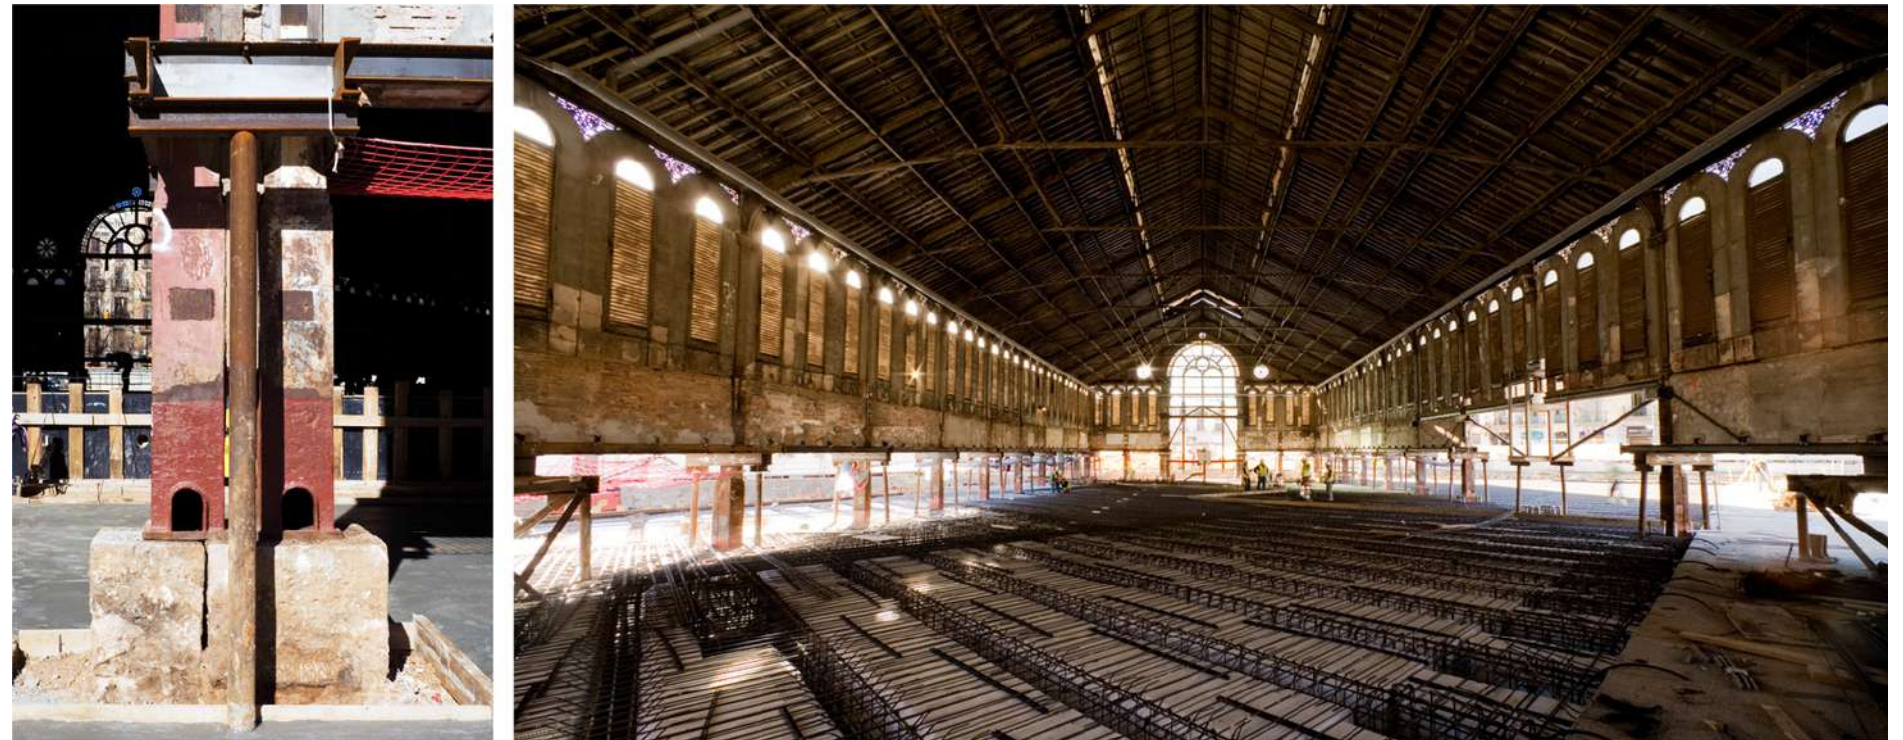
Old façade fastened to allow the concrete to be poured for the new floor slab.
